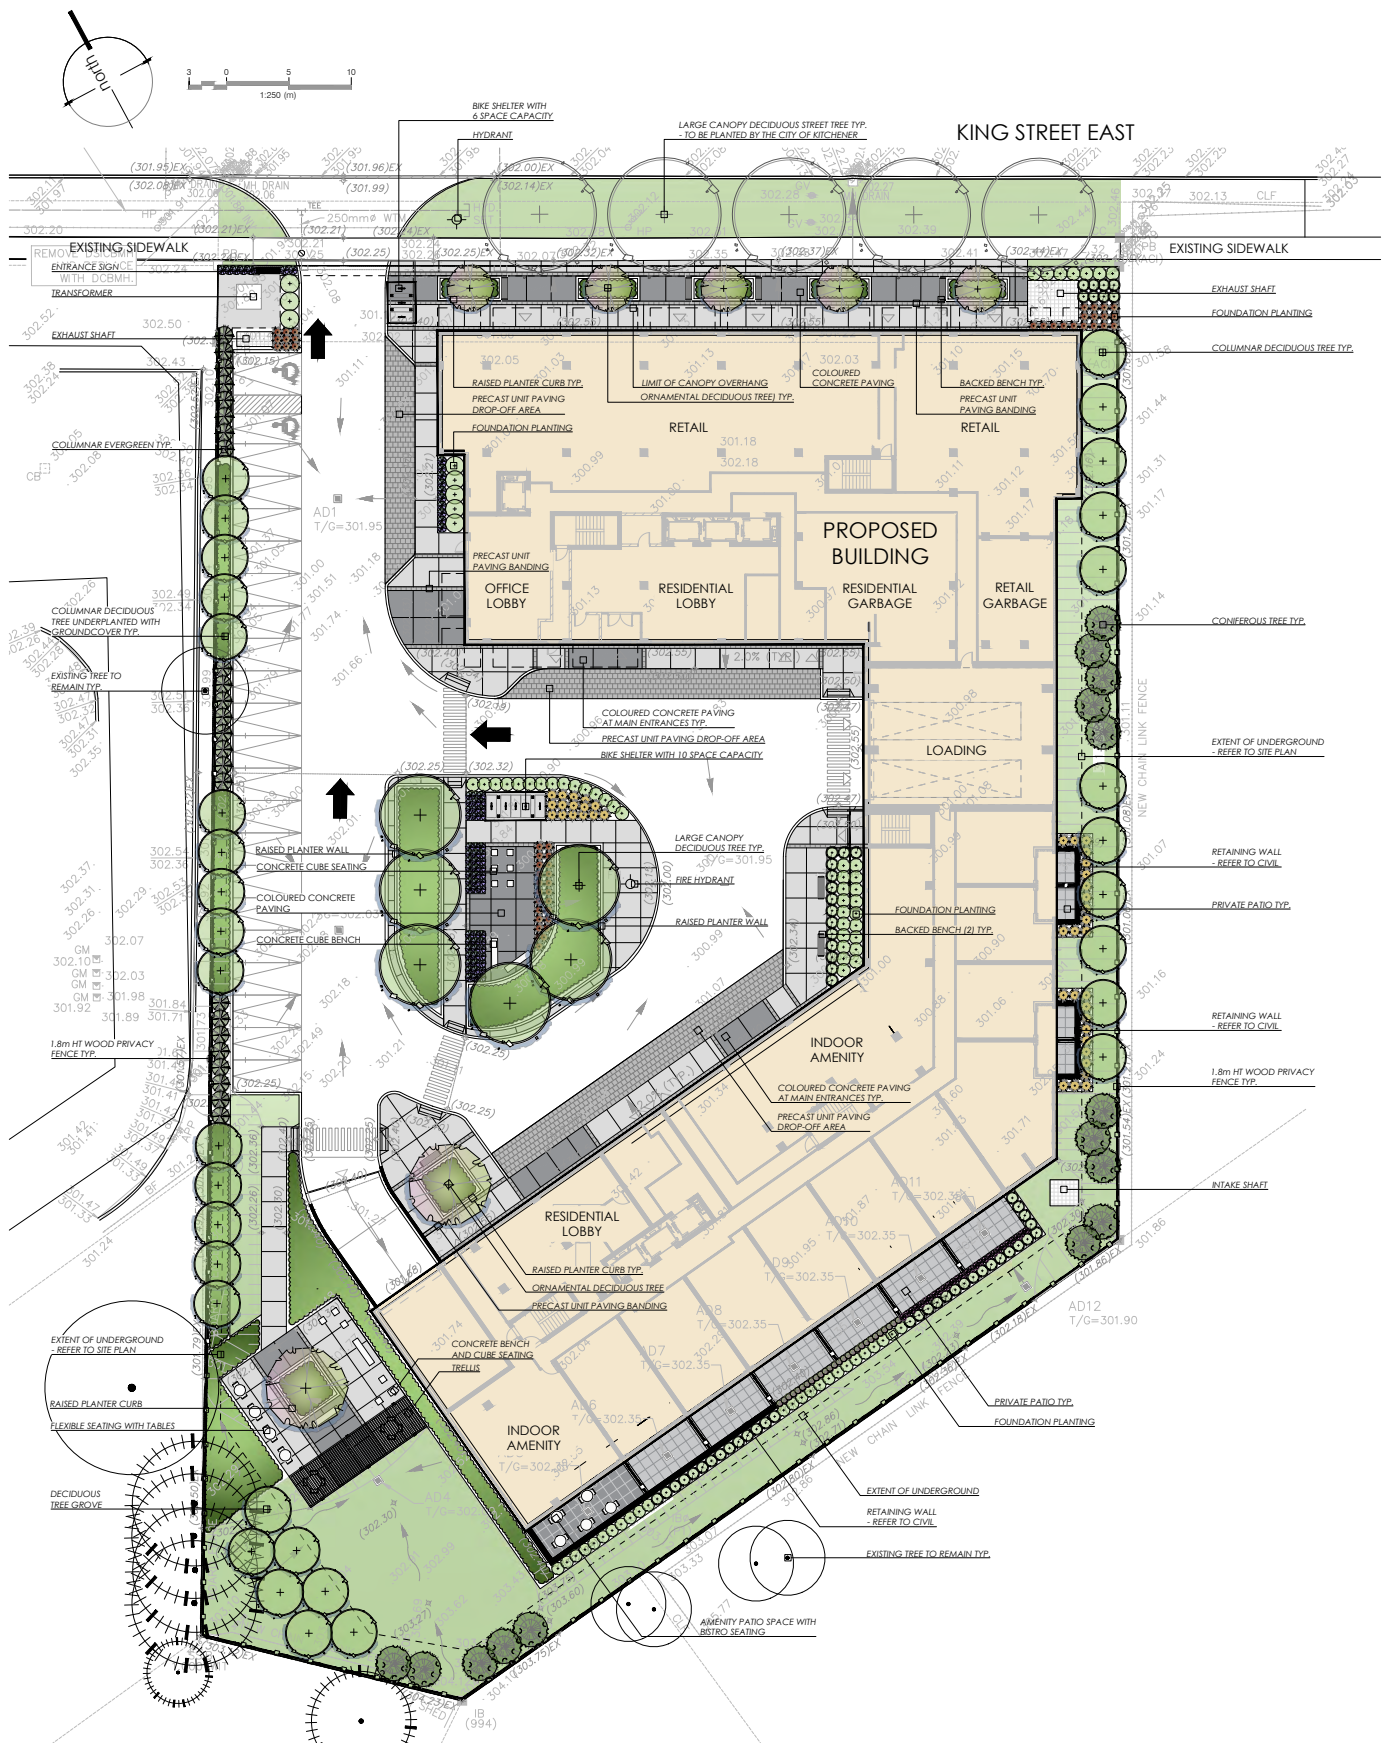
Landscape Plan prepared by Adesso Design Inc.
